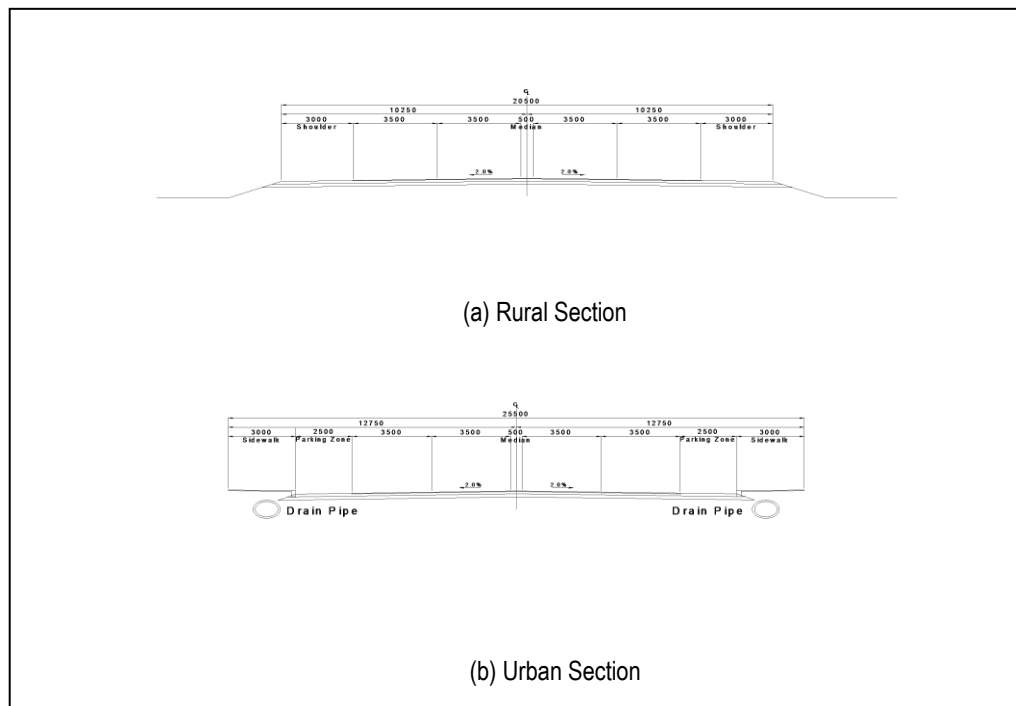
Cross Section of Widening of the NR No.5 and Bypasses
